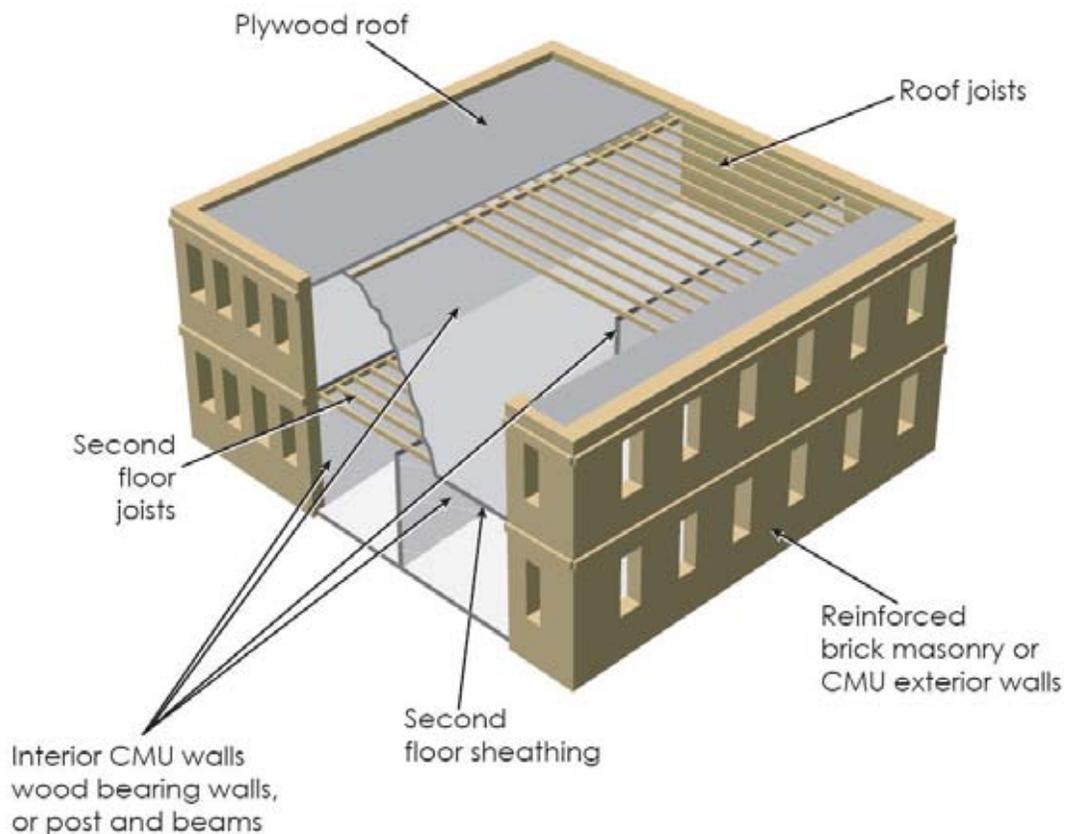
RM1u Building Type: Reinforced Masonry Bearing Walls
